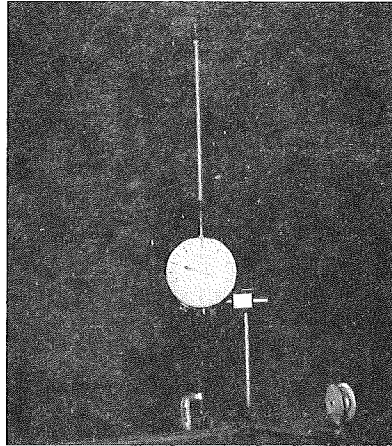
Dial Gage to Measure Overall Shortening Located Near Top End Fixture
